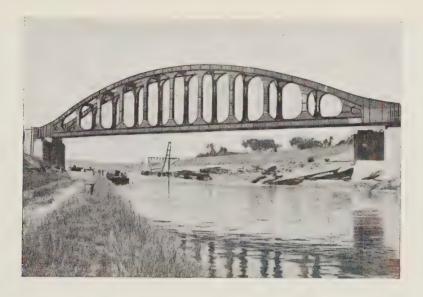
S. N. C. B. Gellick bridge over the Albert Canal. - Span : 370 ft.
